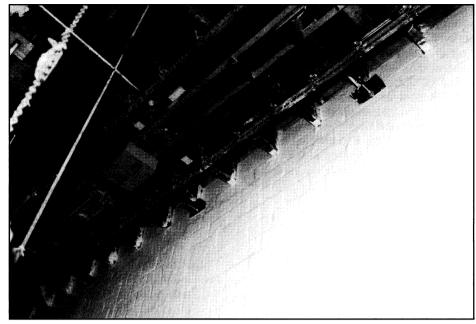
Interior of wall at ceiling (Photo courtesy of External Reinforcement, Inc.)
